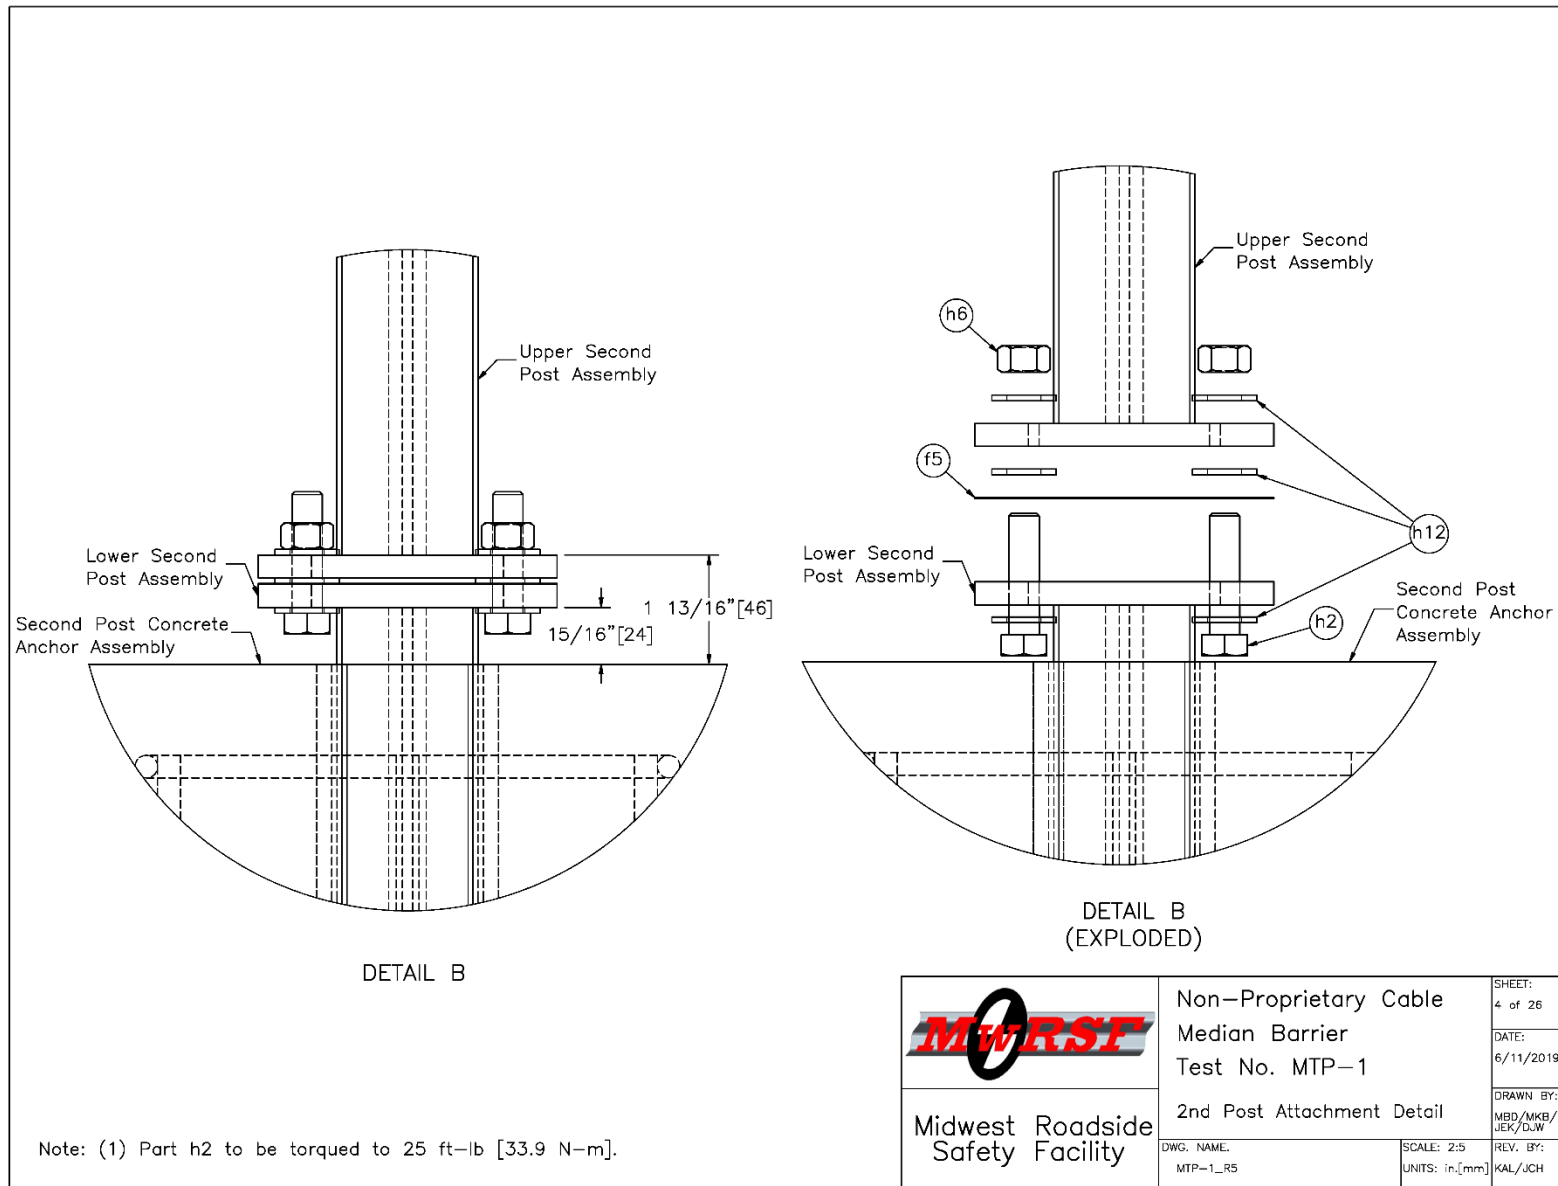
Second Post Attachment Detail, Test No. MTP-1
